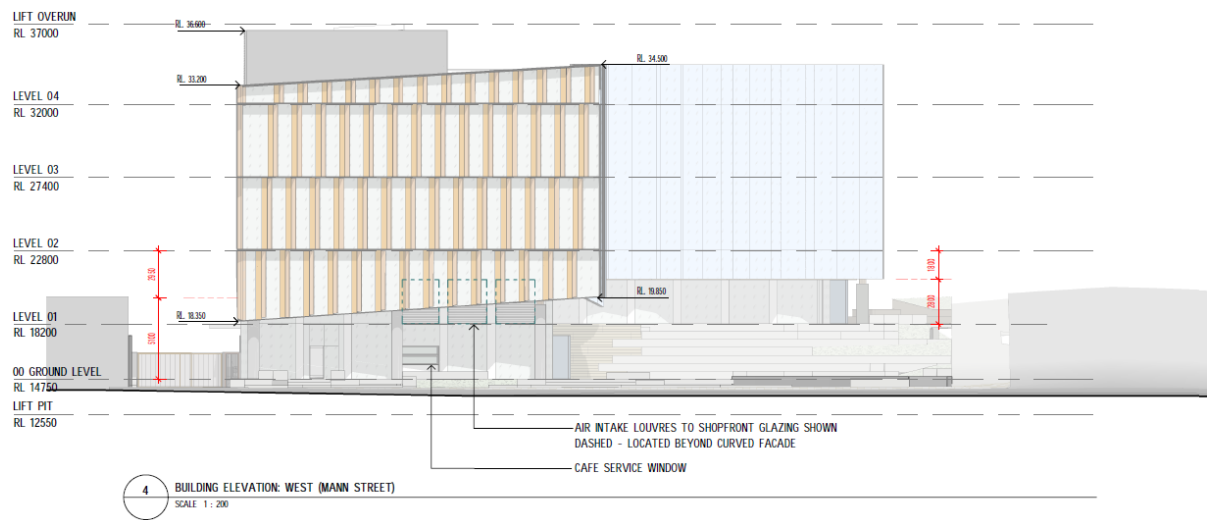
| Mann Street / Western Elevation (Source: Applicant's documentation)
